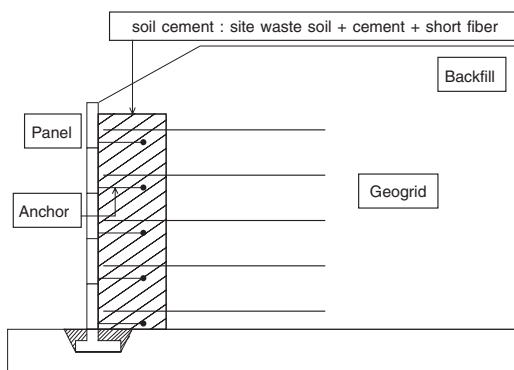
Schematic view of the reinforced soil wall combined with soil cement.
